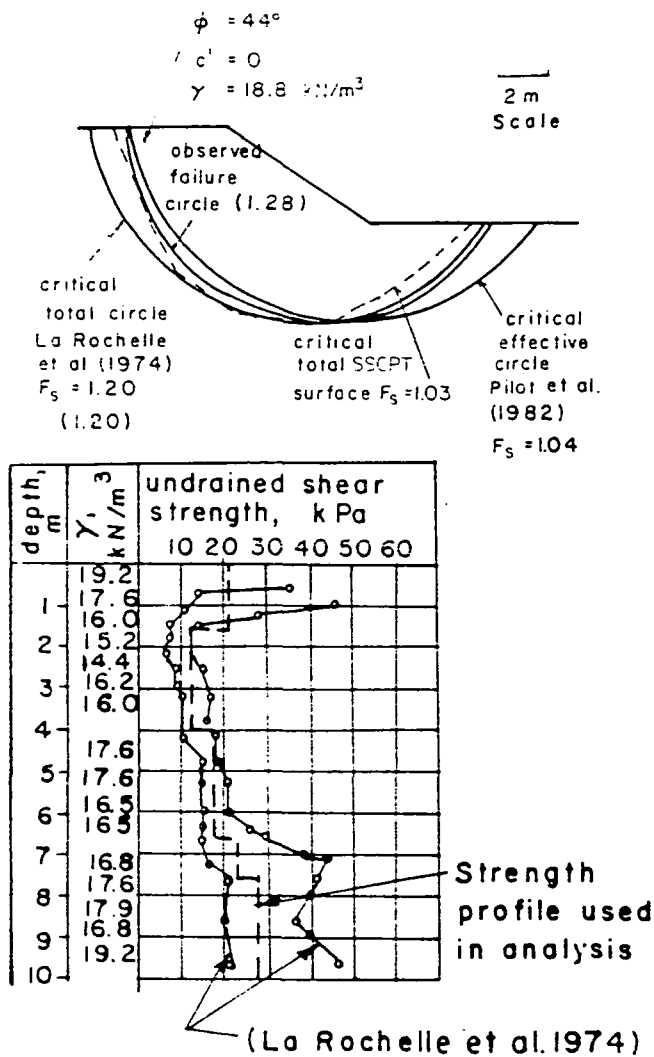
Subsurface conditions and failure paths for the St. Alban embankment.
